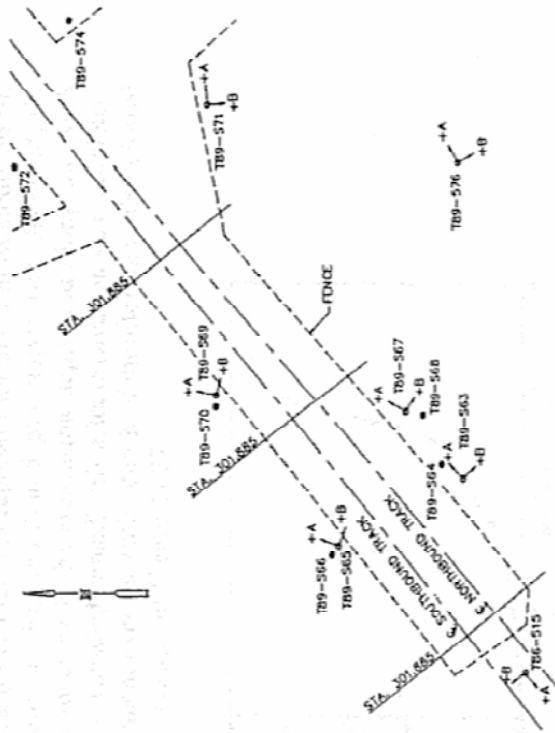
Excavation for tunnel portal at Edmonton, Canada—location of slope monitoring instruments.<sup>72</sup> ⊕ = slope inclinometer; ⊗ = piezometer.
